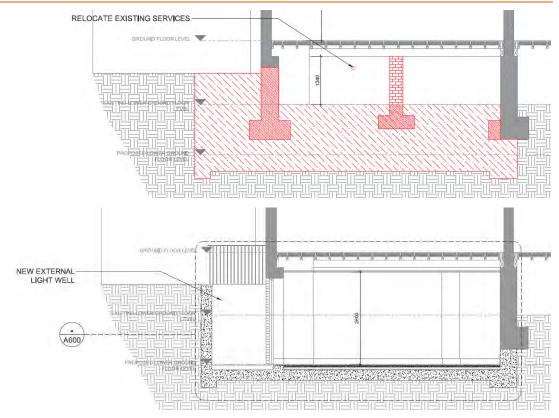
Draft cross-sections of existing (top) and proposed (bottom) basement works
